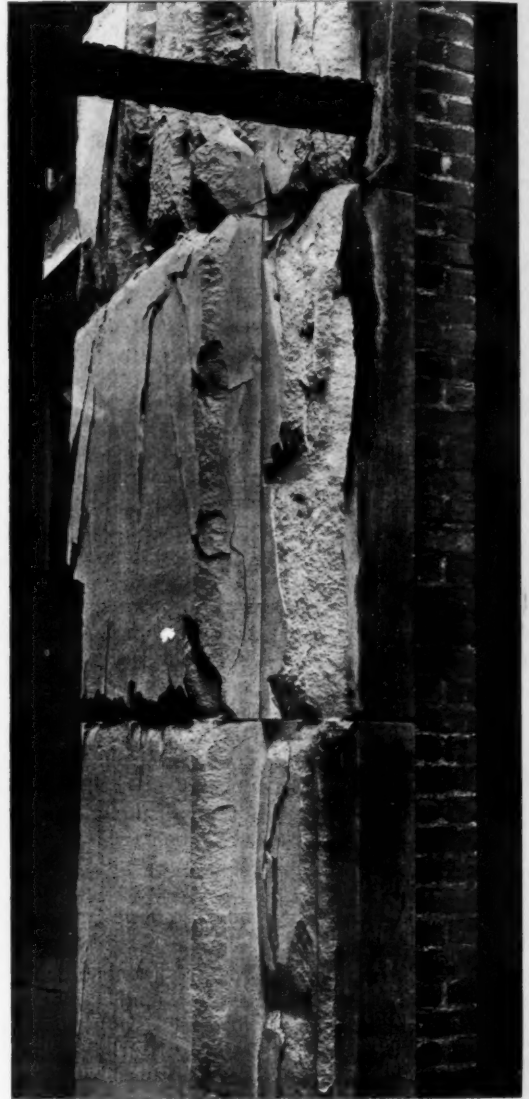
Another view of the damaged limestone veneering on one of the piers
